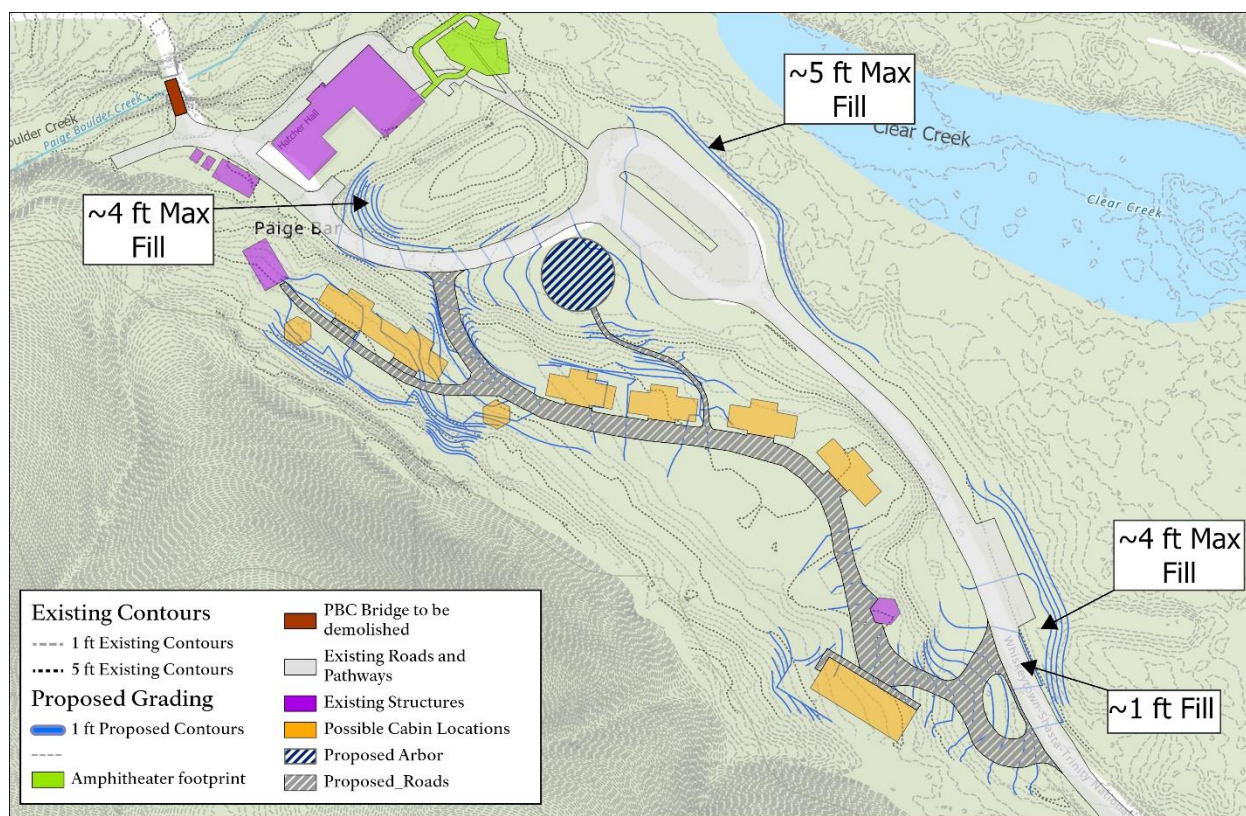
Conceptual schematic of proposed utility and road development site plan for WES.
